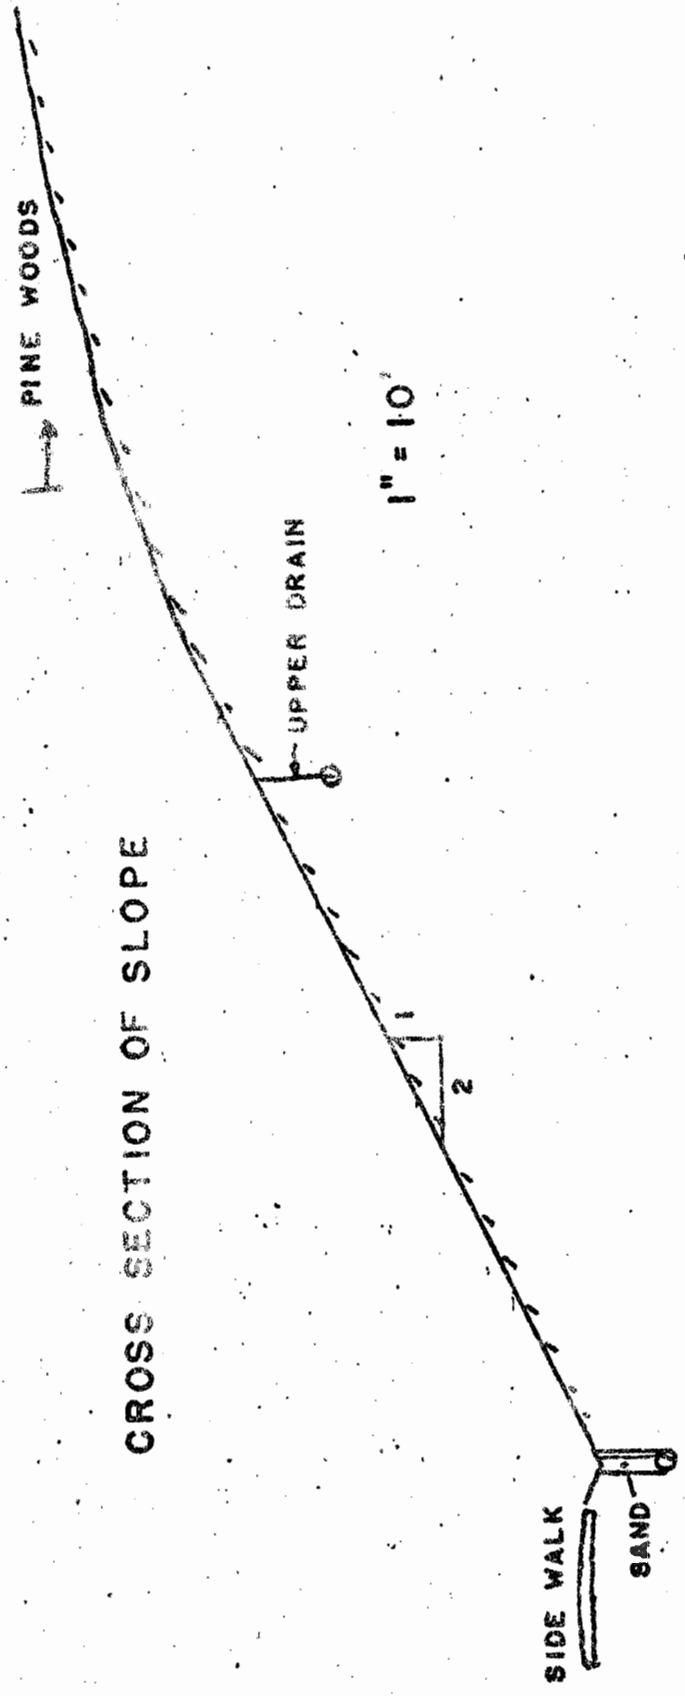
INSTALLATION OF PREFABRICATED DRAINS
